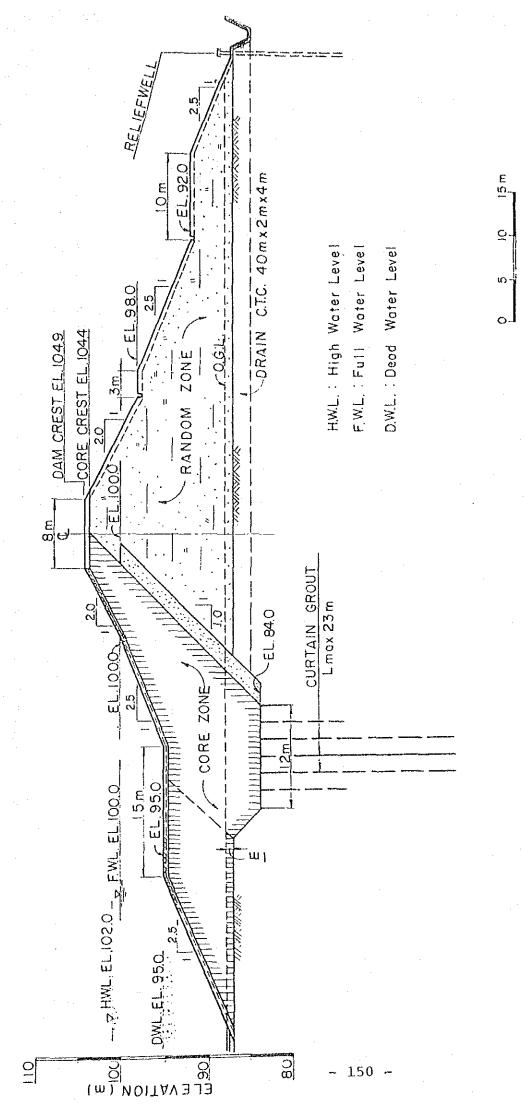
Typical Cross Section of Khlong Pho Dam
